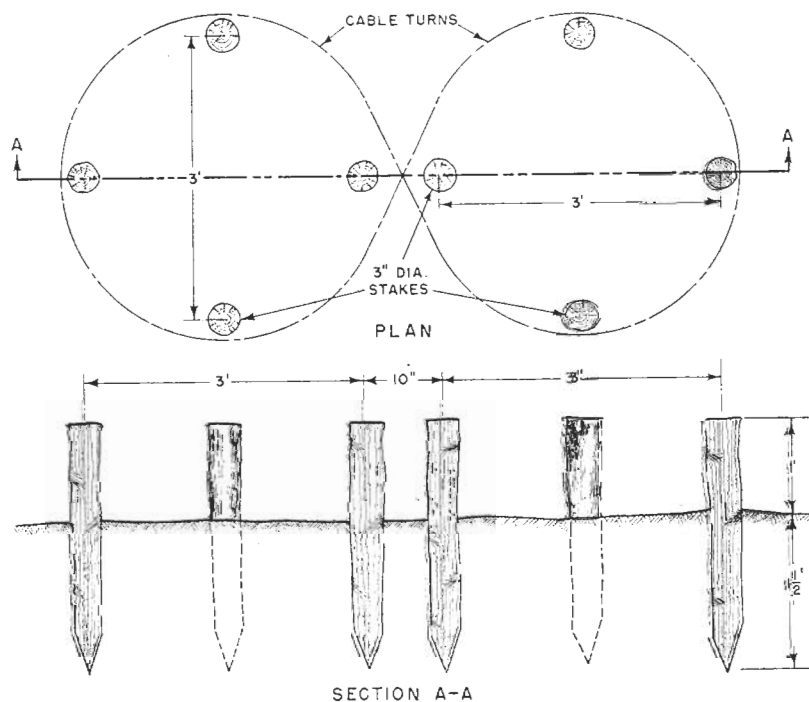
Cable frame. Frame stakes are driven into ground at loading site and cable coiled as shown.
